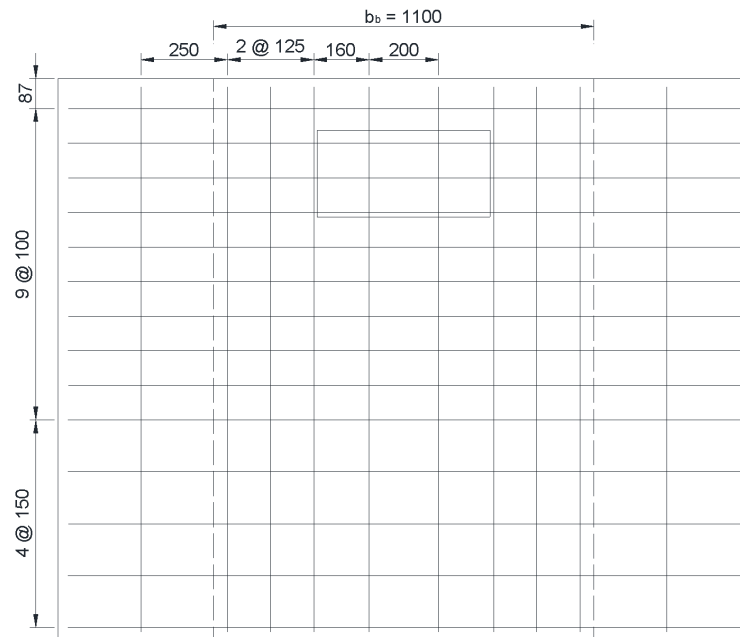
Top mat reinforcement details for Specimen 2 (15M bars) (units in mm)
